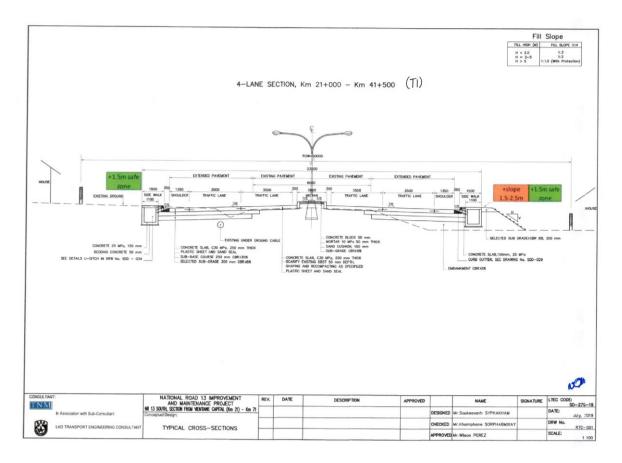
Typical Cross-Sections of 4-Lane Section (T1)
